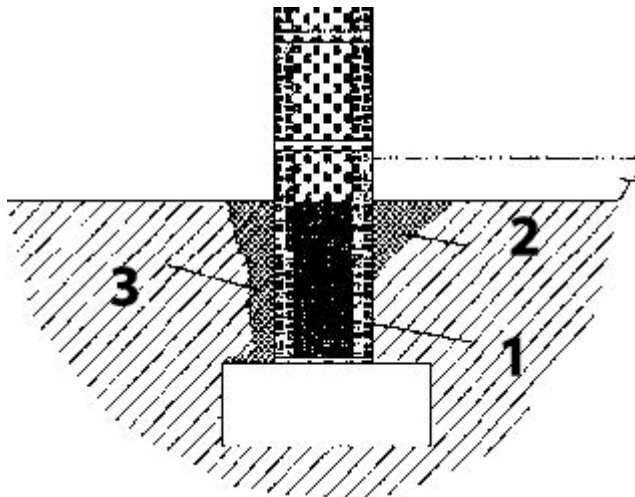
The completed treatment of this floating slab block foundation indicates treatment of:
